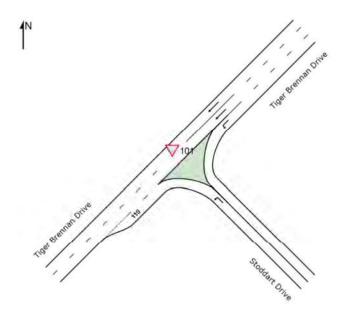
Intersection 2 Modelled SIDRA Layout
